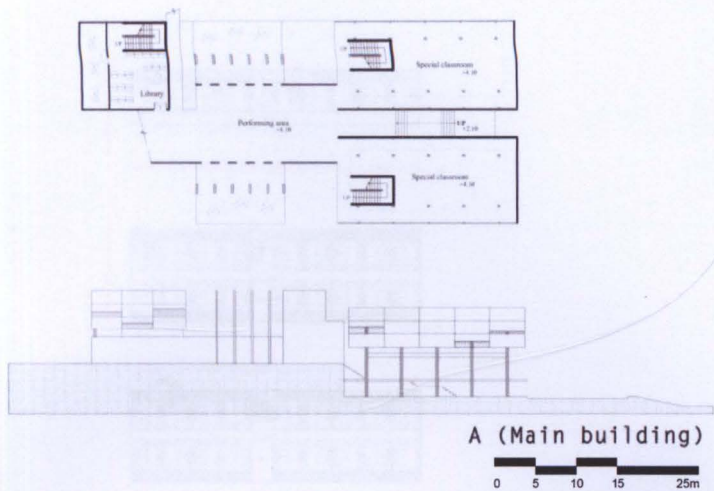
Schematic 2: 1st floor plan and elevation of Performance building (Image source: Author's image)
